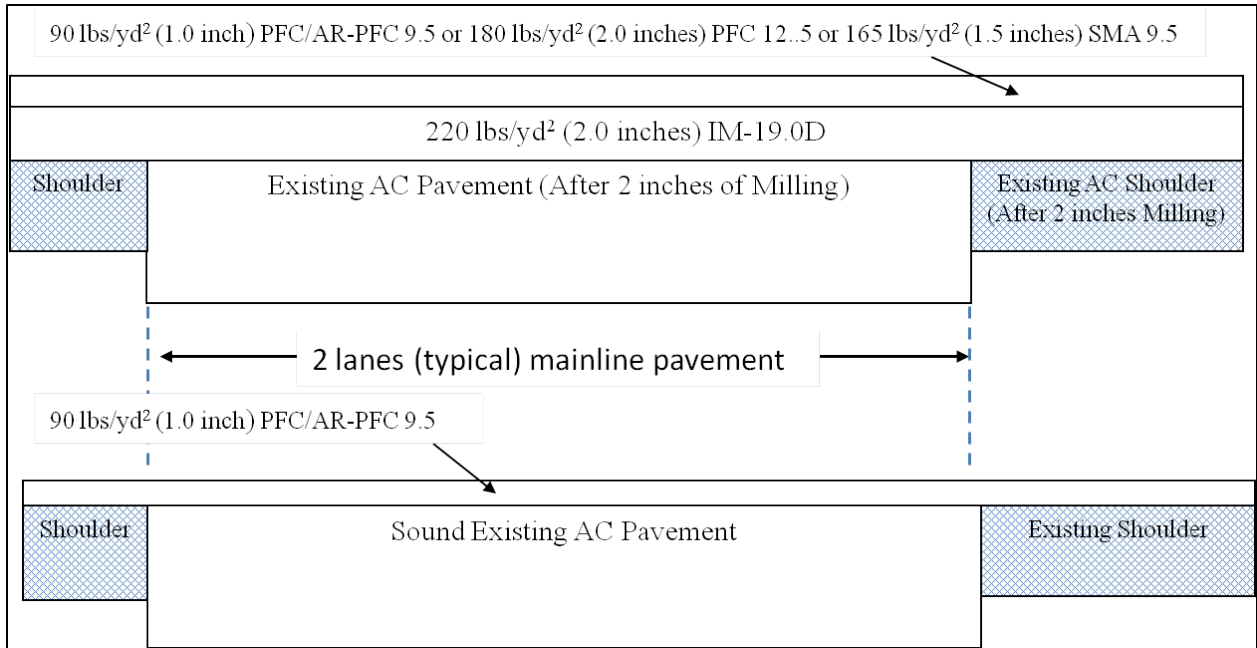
Typical Cross-sections of Pavement Structure with Asphalt Base: Top, QP Demonstration Projects 1 and 2; Bottom, QP Demonstration Project 1, only.
